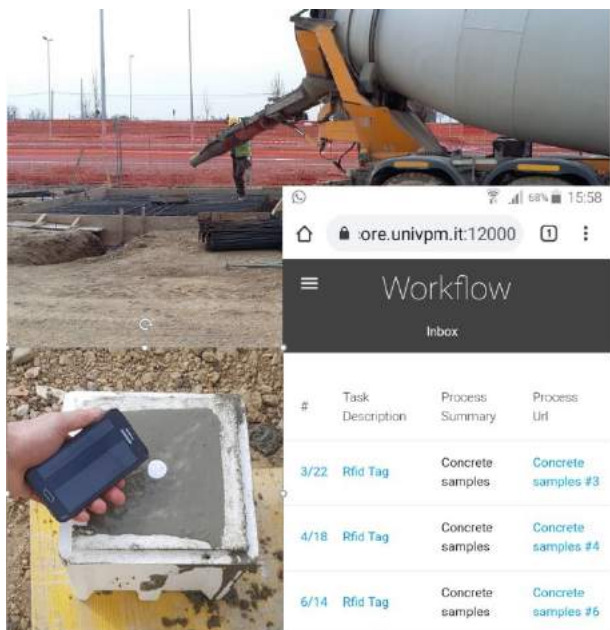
Clockwise from top to bottom: concrete mixer for casting concrete foundations; webapp for blockchain; on site concrete specimen with rfid read with smartphone.
